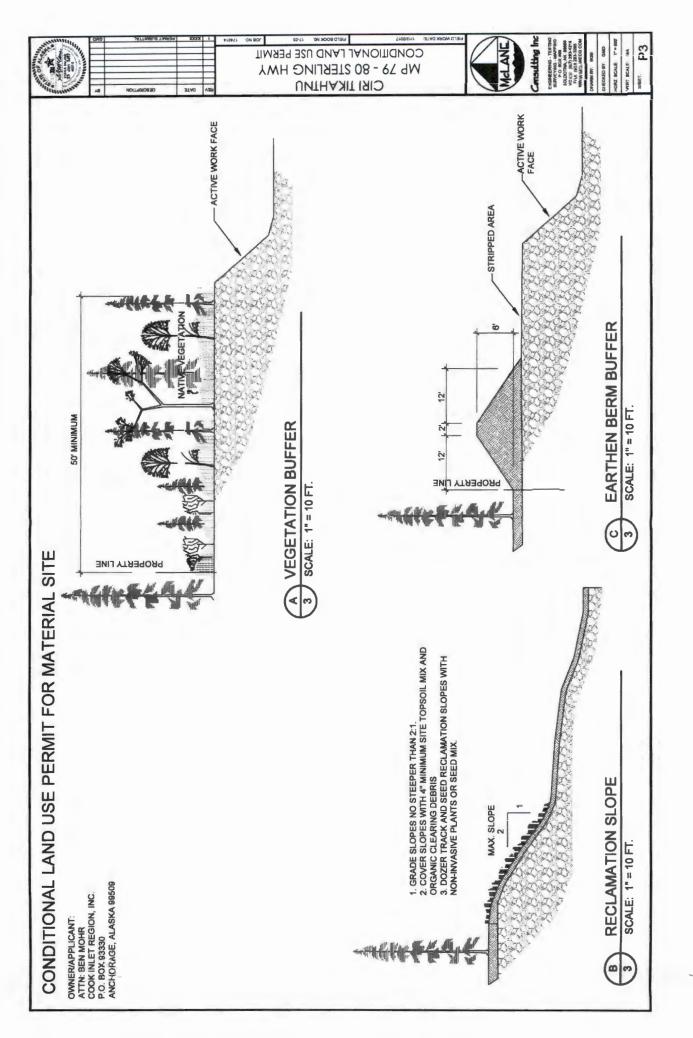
EXHIBIT A - SAND AND GRAVEL EXTRACTION CONTRACT STERLING GRAVEL PIT
